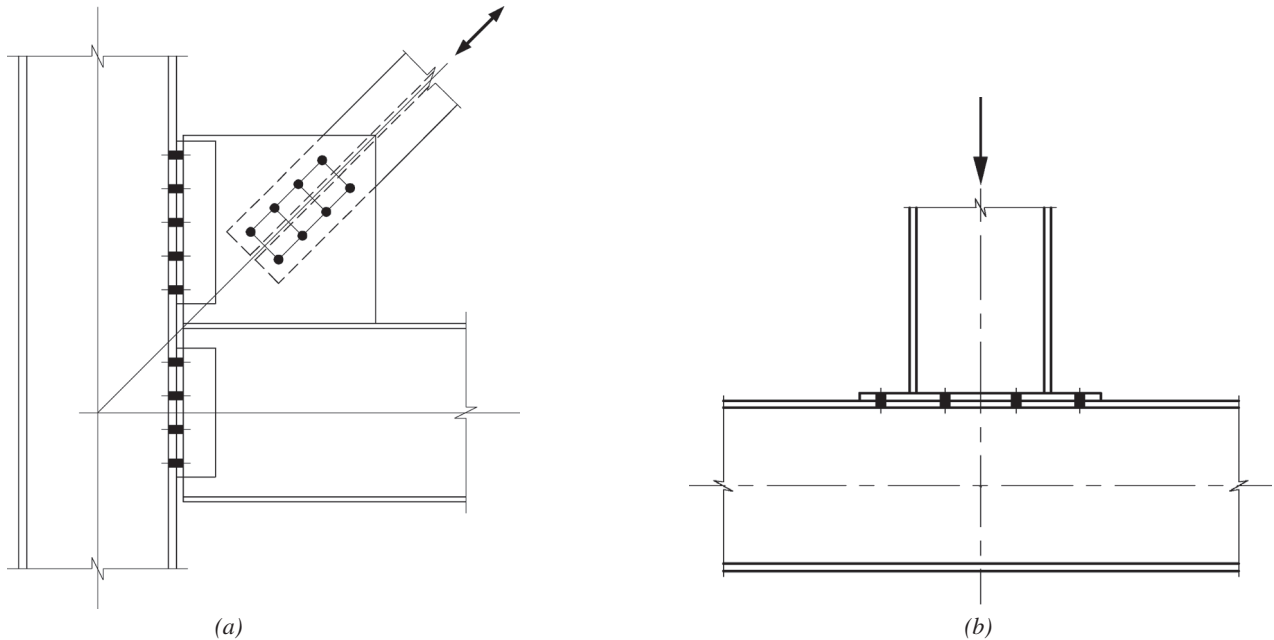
Common discontinuities in steel-frame structures: (a) vertical brace connection; (b) post-to-girder connection.
